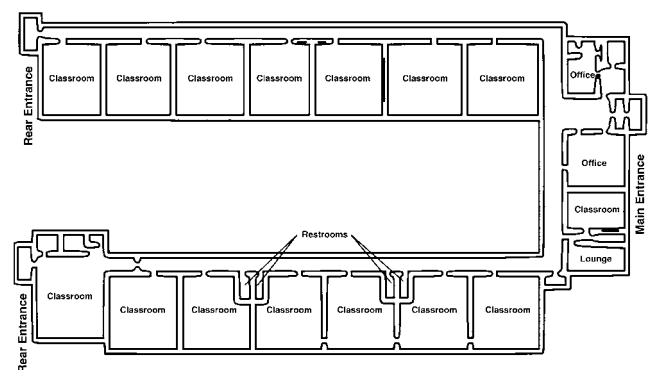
Floor plan of the north wing of the Burtsfield Elementary School, West Lafayette, IN.
